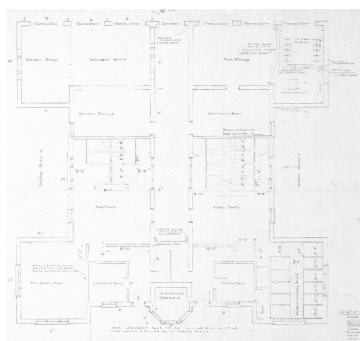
Proposed floor plan for the bathhouse at Forest River Park. Source: Robert Charles Engineering Associates. Plans for the swimming pool, Forest River Park (February 1971).
